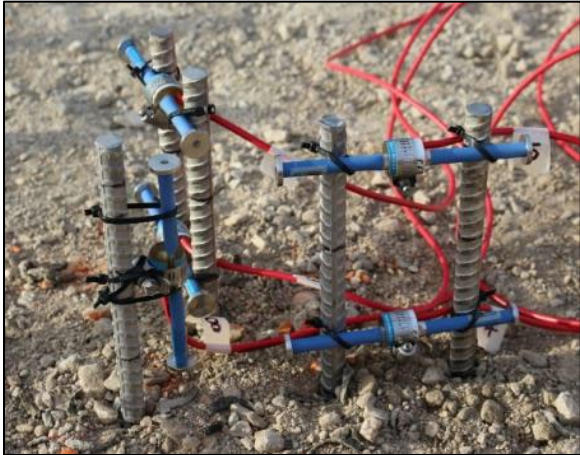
Detail of Strain Gage Installation in the Corner of the Panel
